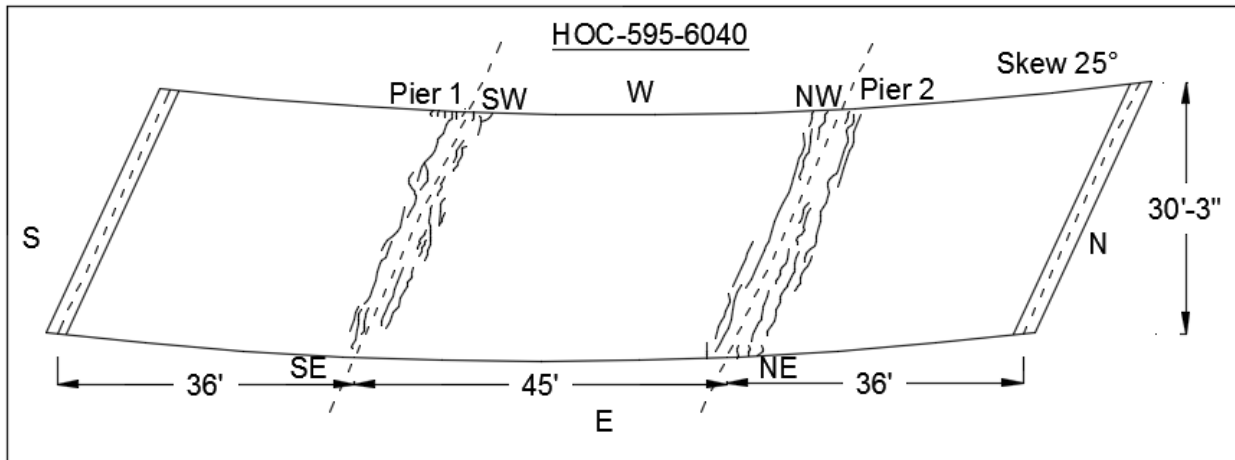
Bridge Inspection Pictures and Crack Map – HOC-595-6040
